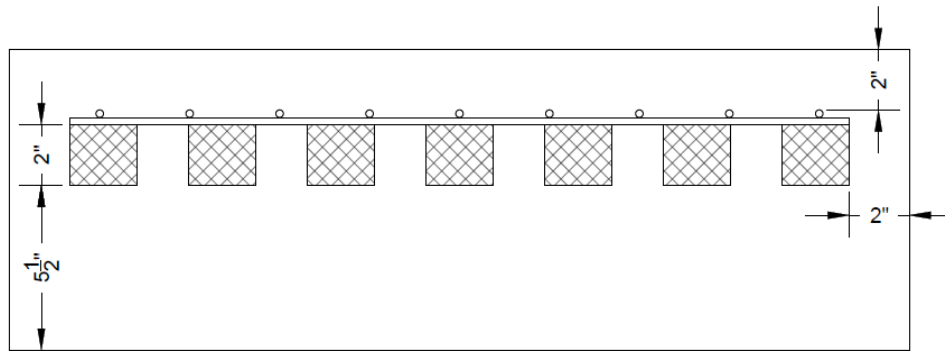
Cross-Section Diagram of GFRP Rebar Test Slab
